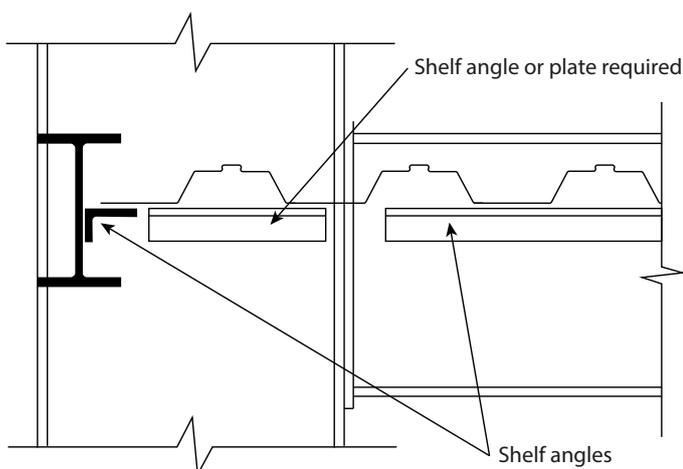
Decking penetrated by a 'wide' column and requiring additional end support
